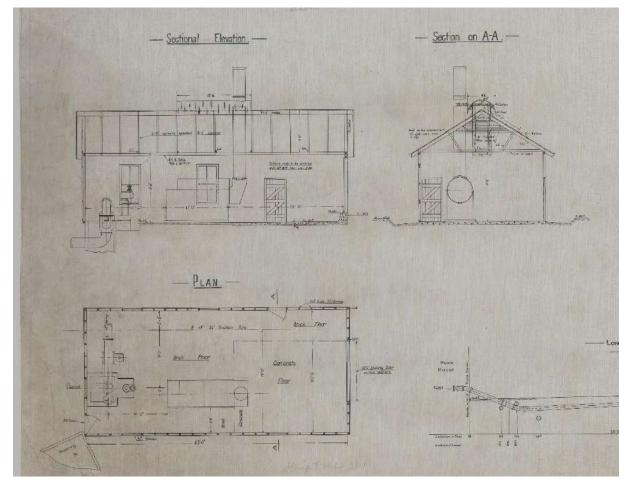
Original construction plans of Pumphouse No 9. AF00065969
